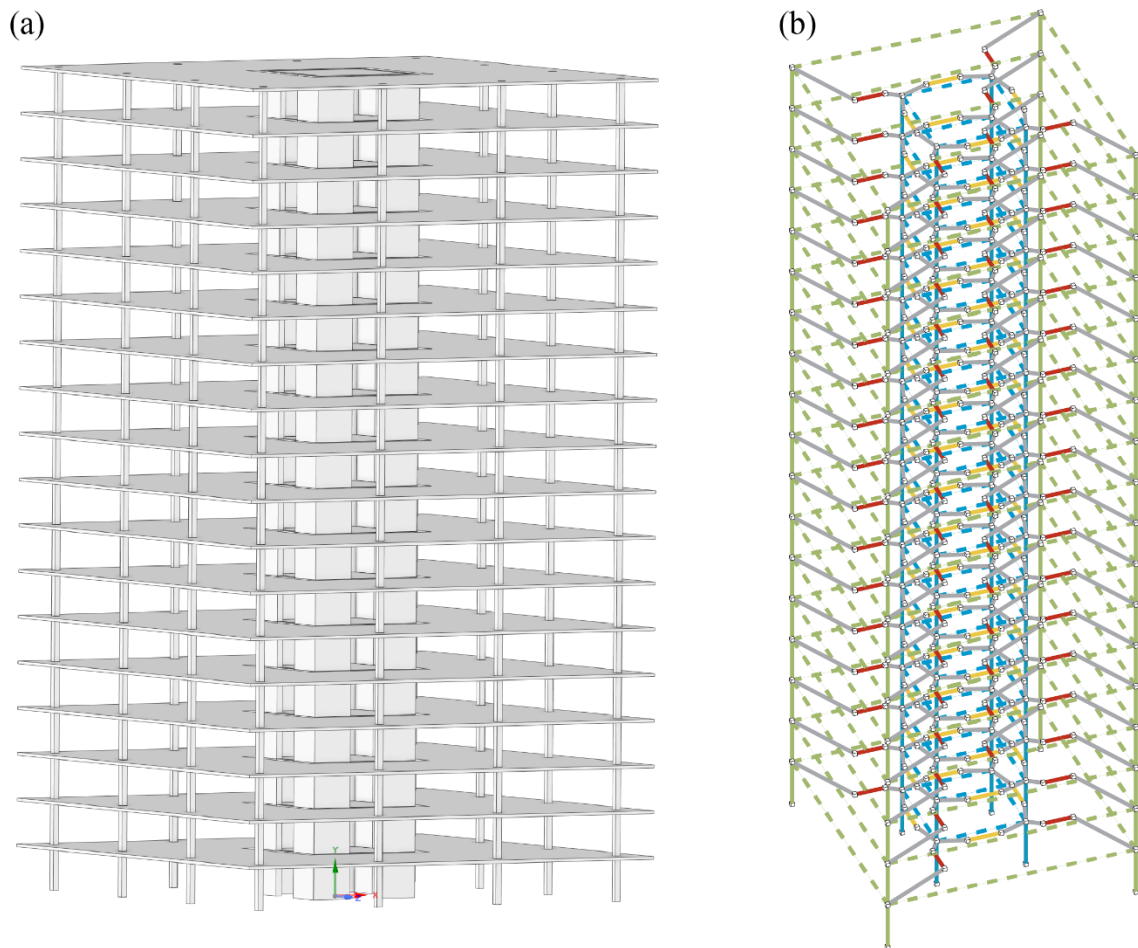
(a) 3D Schematic and (b) Opensees model of the eighteen-story core wall building
